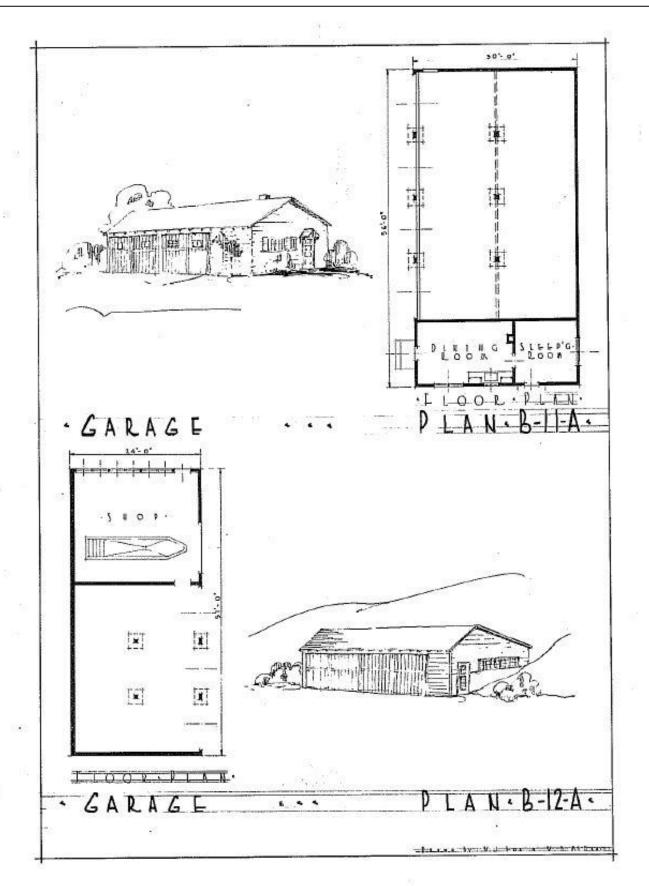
USFS suggested building plans for garages/utility buildings (Fickes, 1935: 549).
